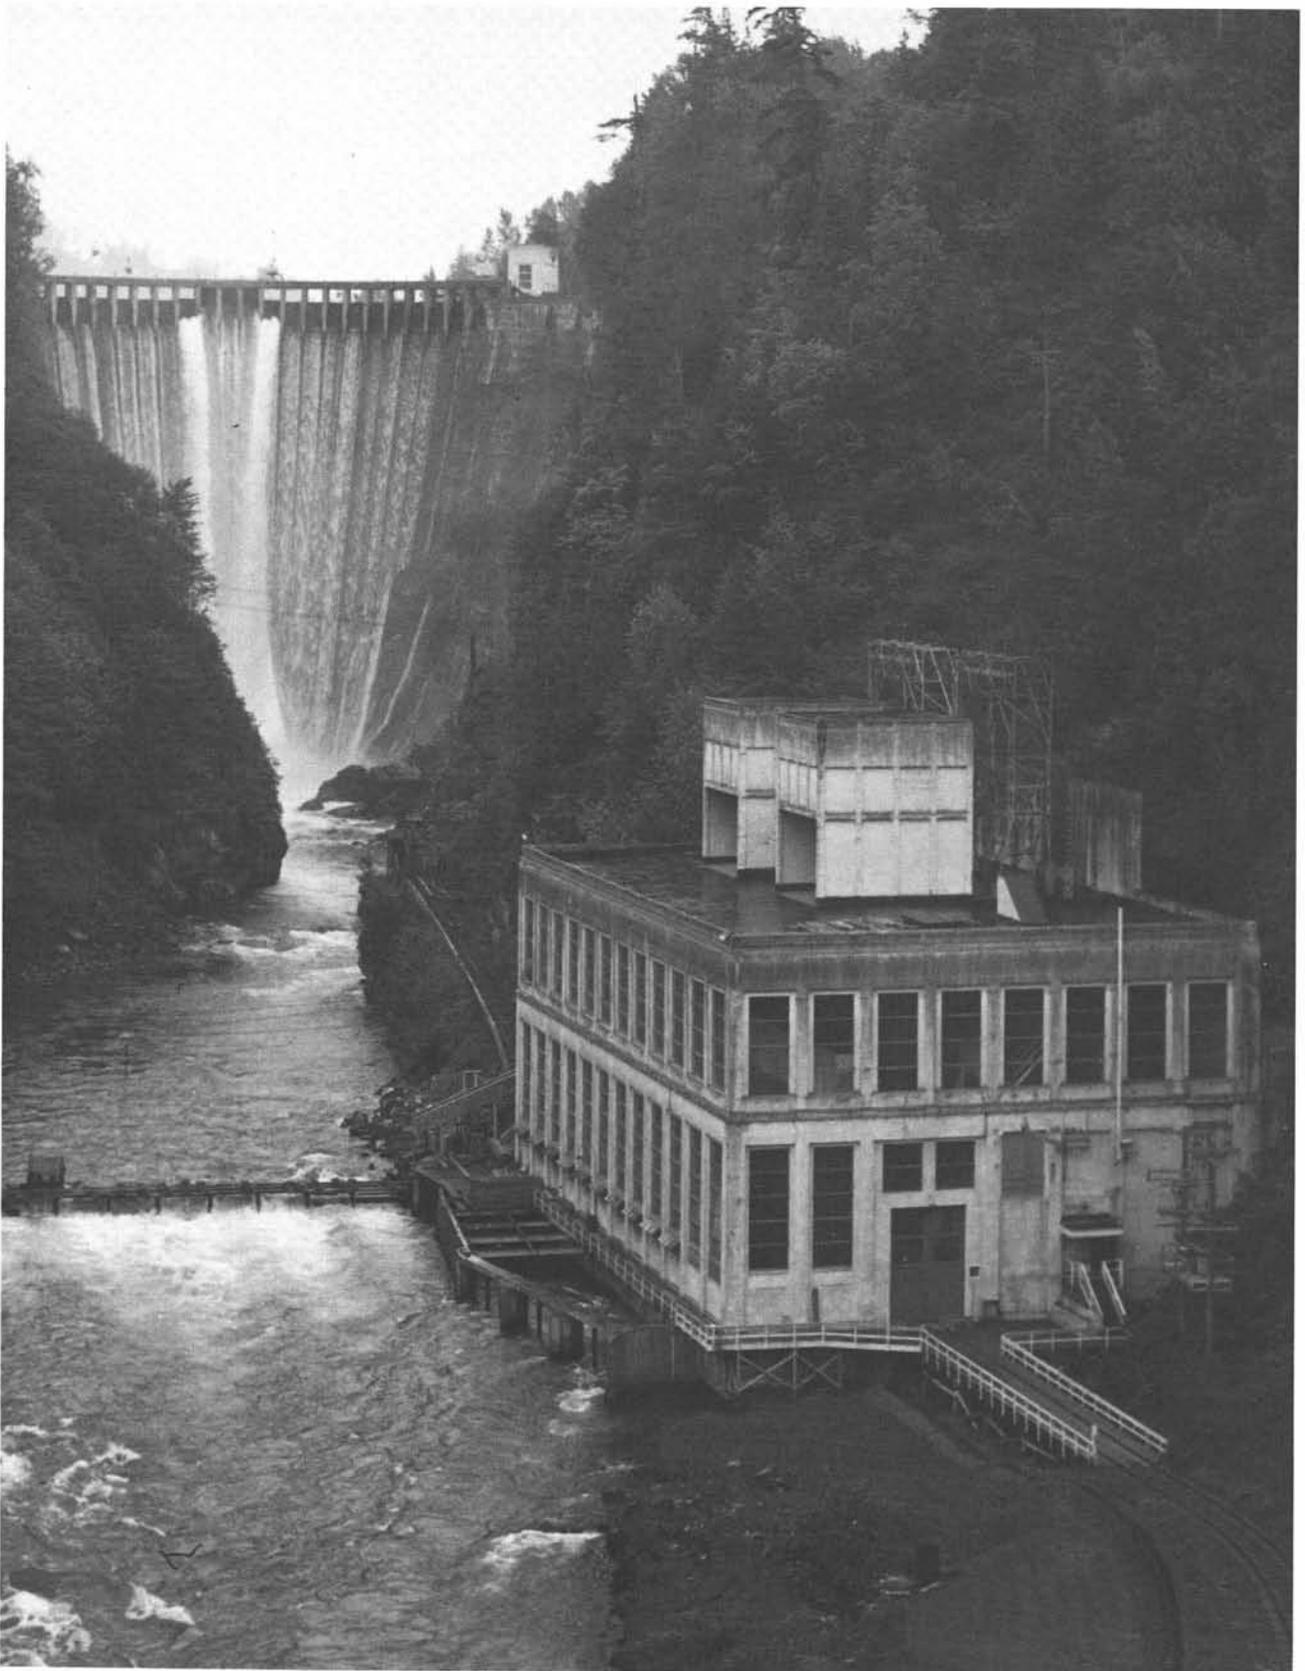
Lower Baker Dam and powerhouse. Photo courtesy of Puget Sound Power and Light Co.
